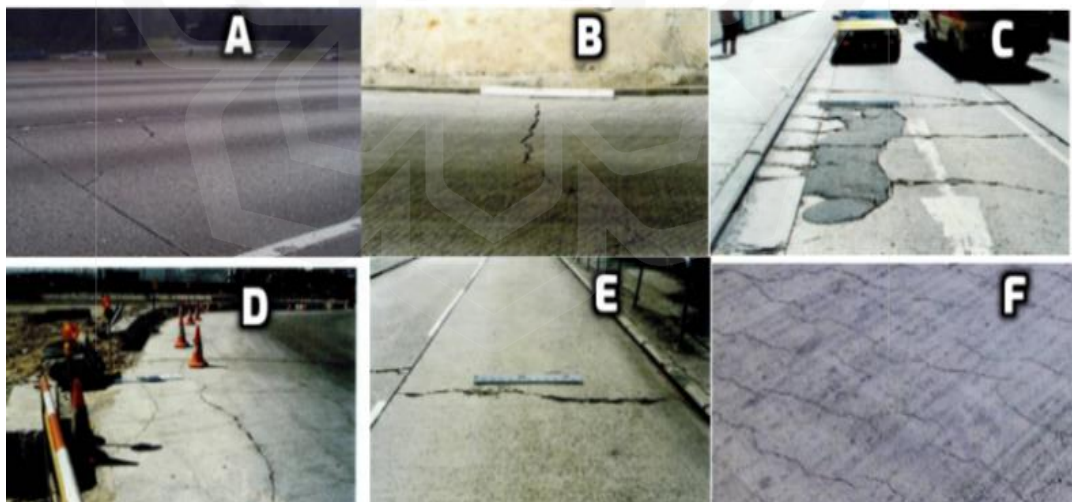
Classification of Cracks in Concrete Pavements: (A) Corner, (B) Diagonal, (C) Block, (D) Longitudinal, (E) Transverse, (F) Shrinkage
